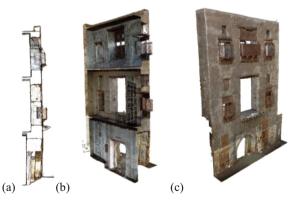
(a) the exterior façade of case 1 (b) the interior façade of case 1 (c) Section
